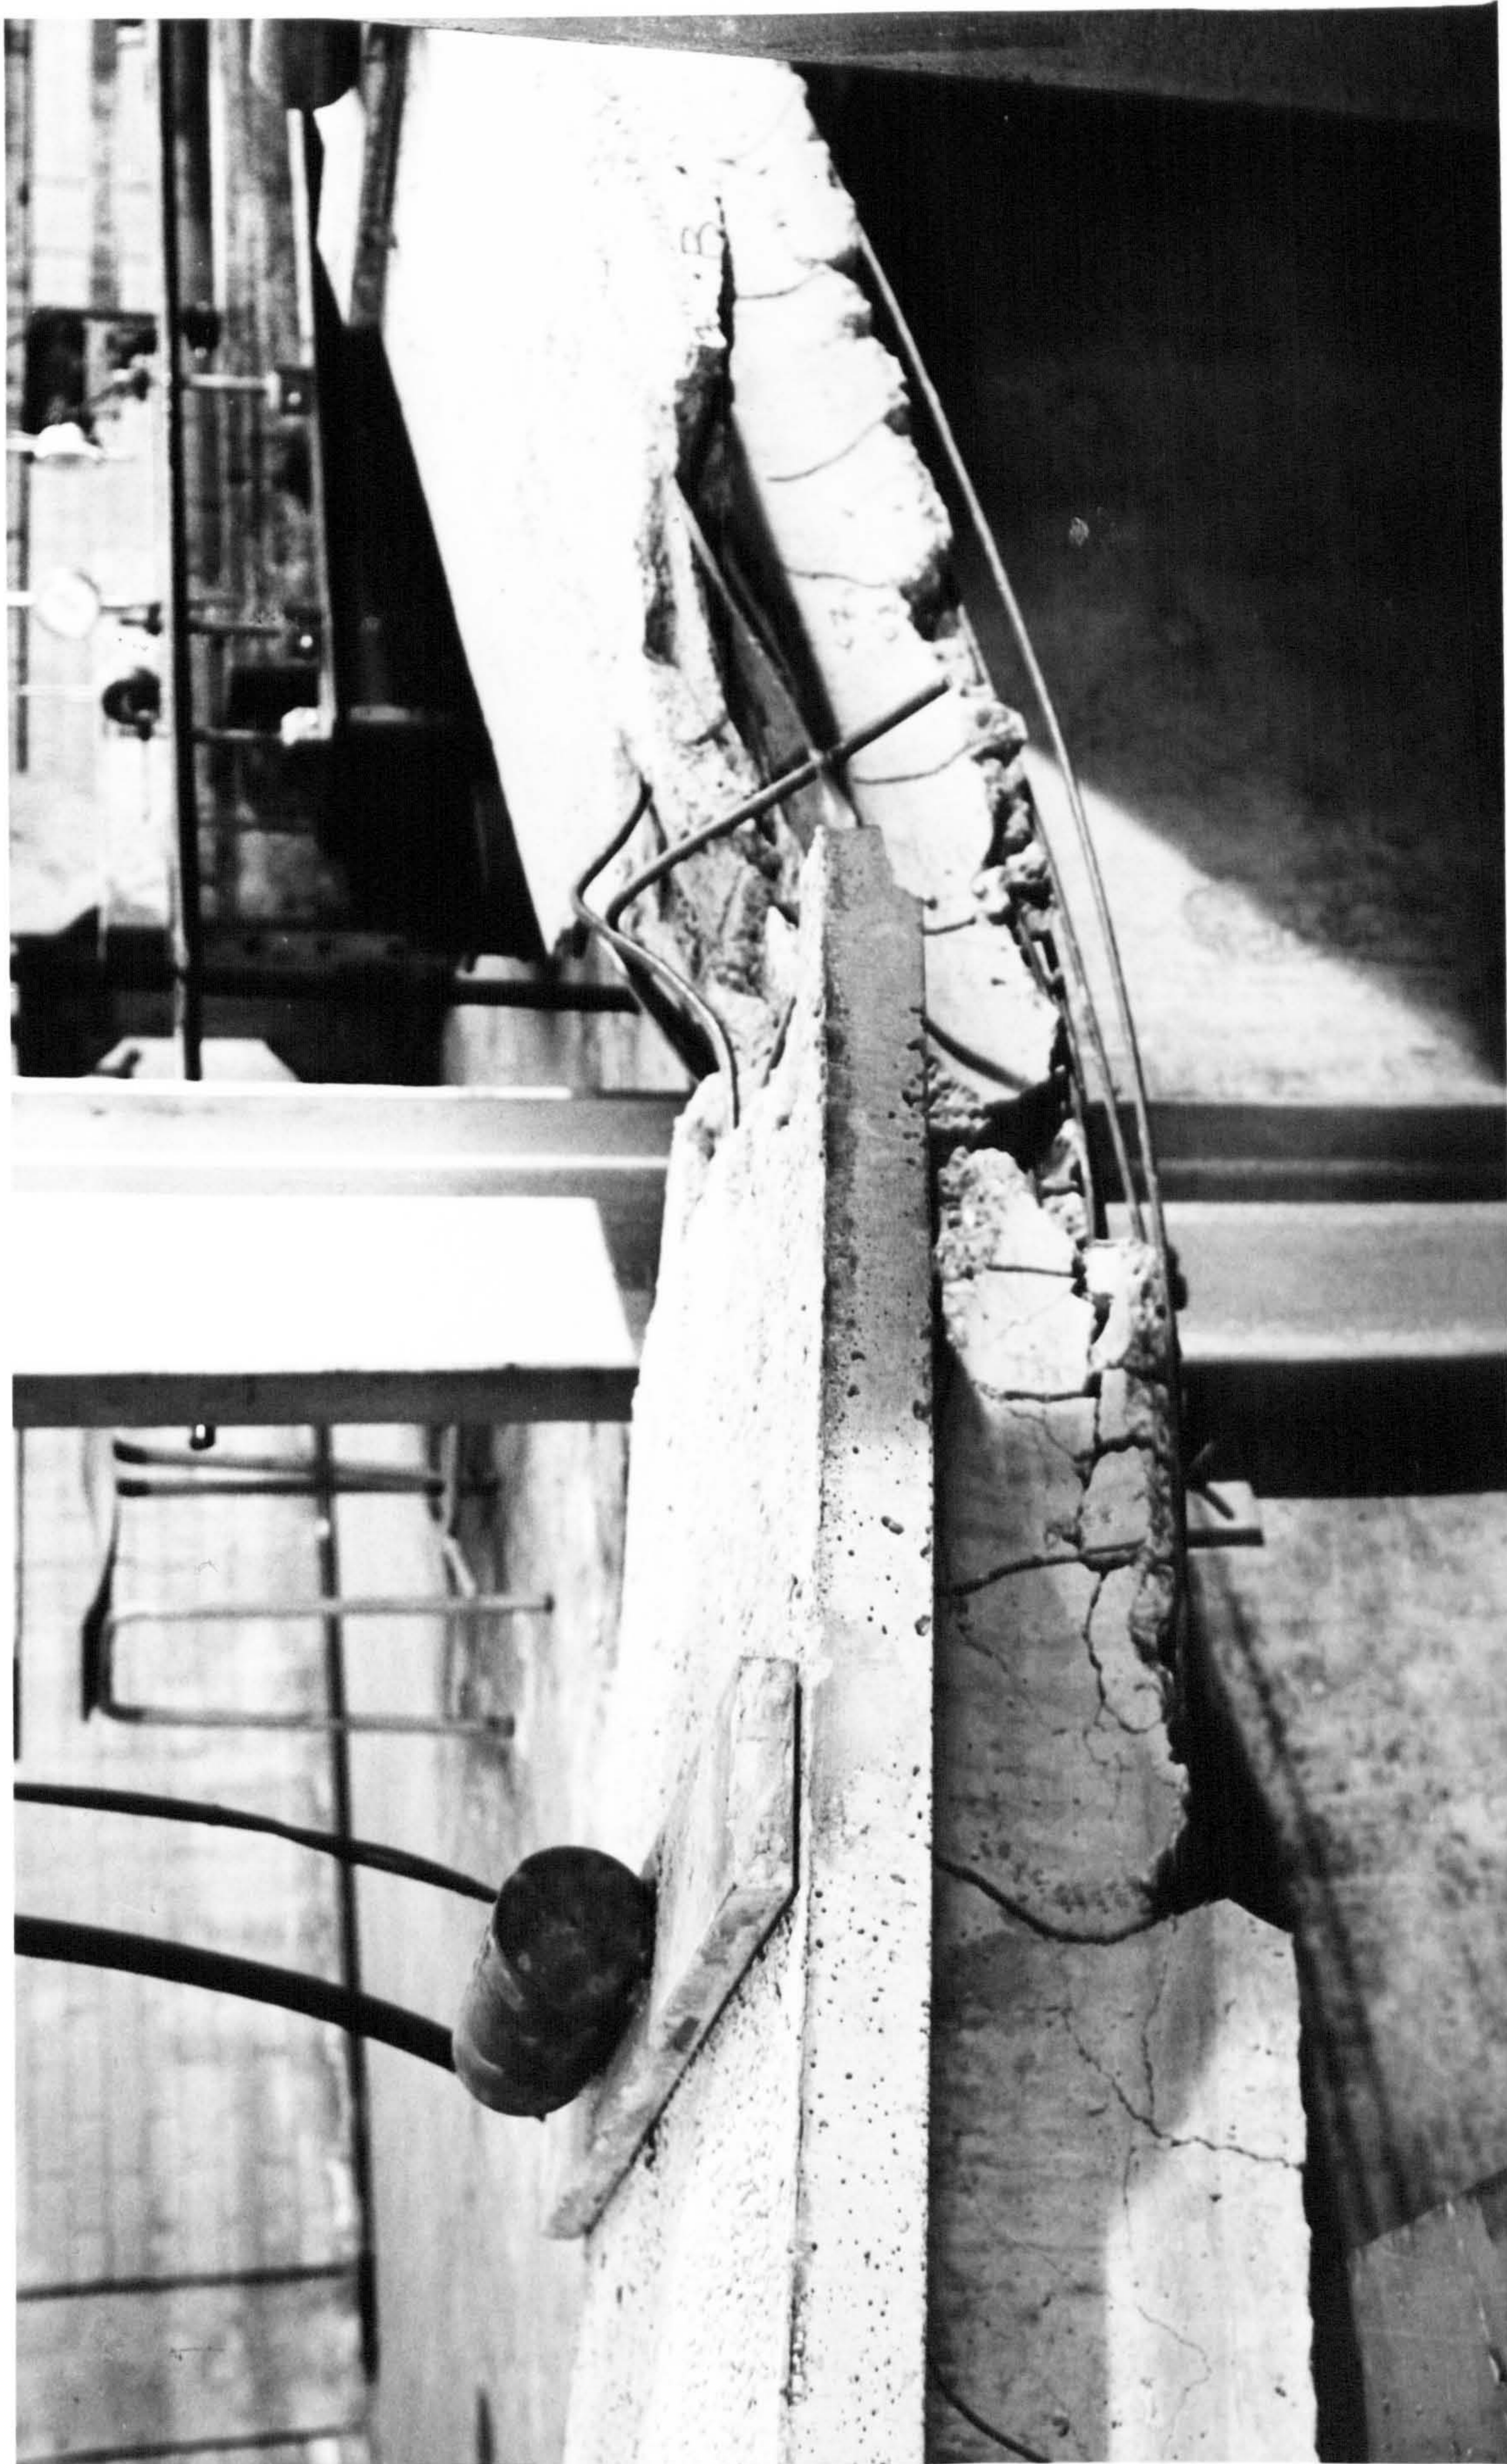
TYPICAL FAILURE FOR CONVENTIONAL CONCRETE COMPOSITE T-BEAM
